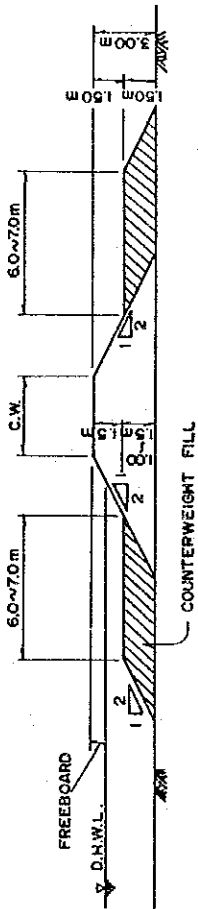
TYPICAL CROSS-SECTION OF INGALERA RIVER
